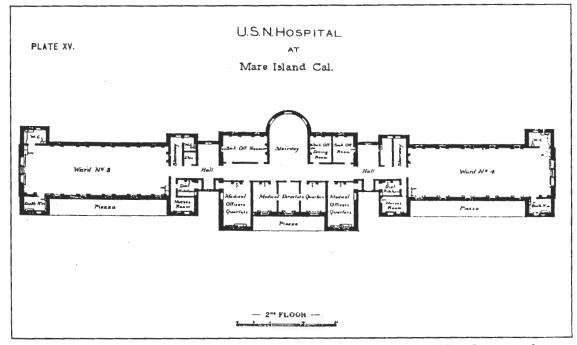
Mare Island Naval Hospital - Second Floor Plan, 1893. Gatewood,
